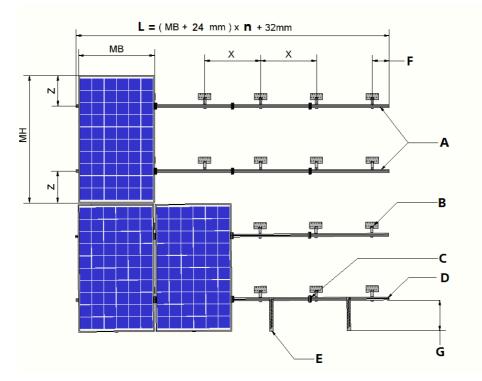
Structure of the TopFix 100 pitched roof mounting system
